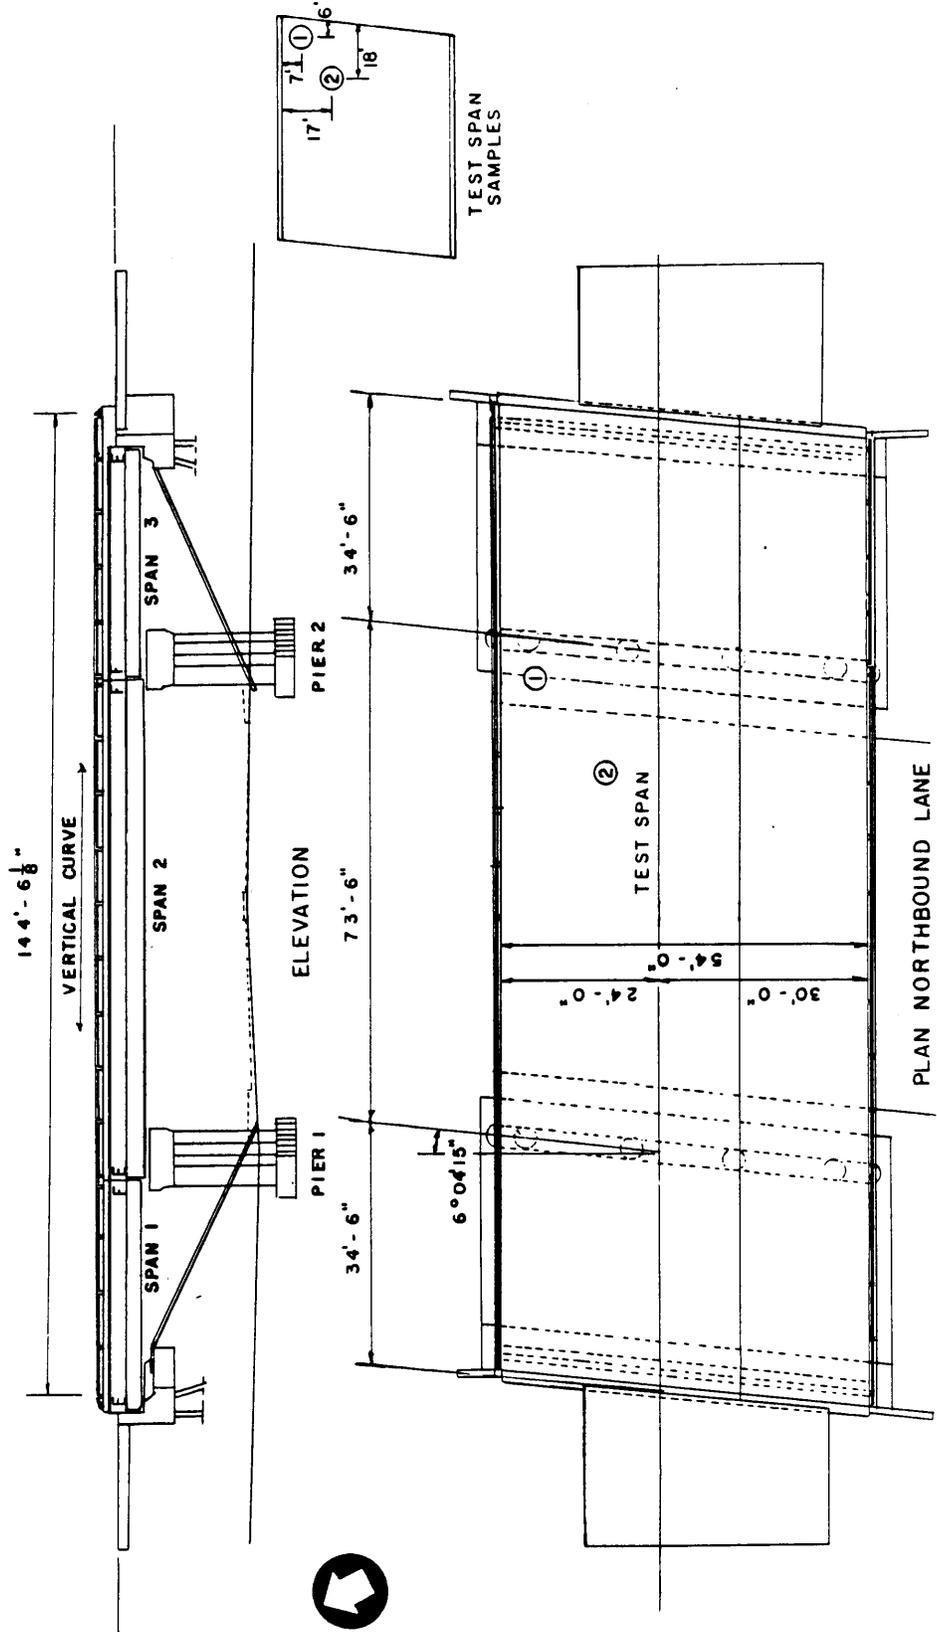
Plan for bridge #16; also shown are the locations of test samples.
